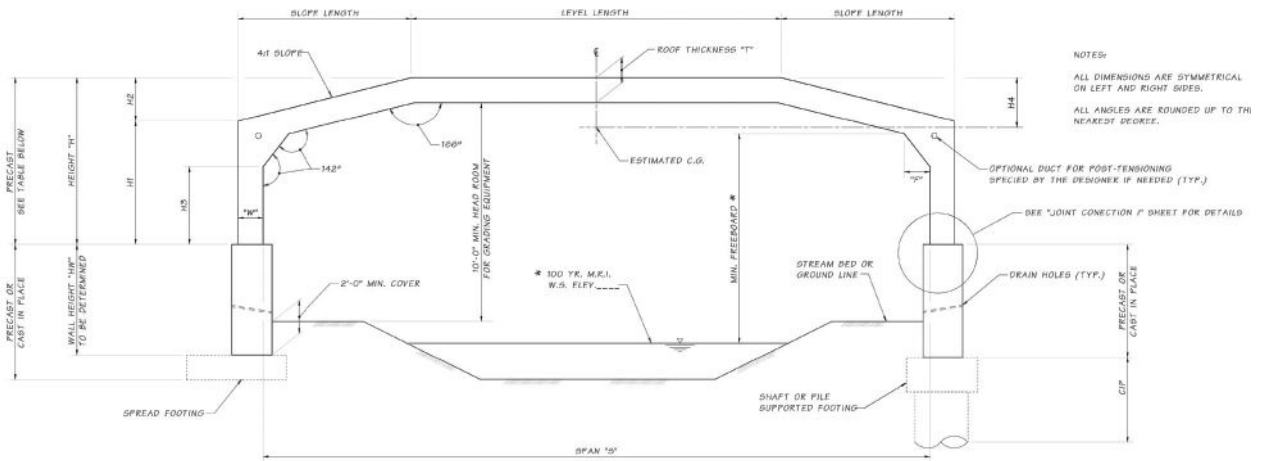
Details of the Washington State Department of Transportation standard precast concrete three-sided structure. The precast concrete unit is supported by either cast-in-place or precast concrete foundation units.
